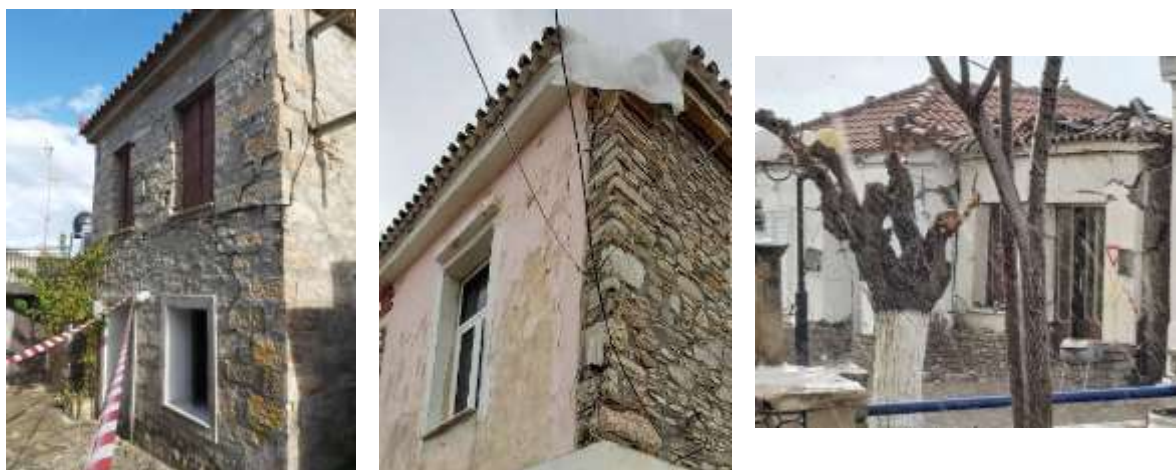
Corner failure in masonry buildings in Samos.
